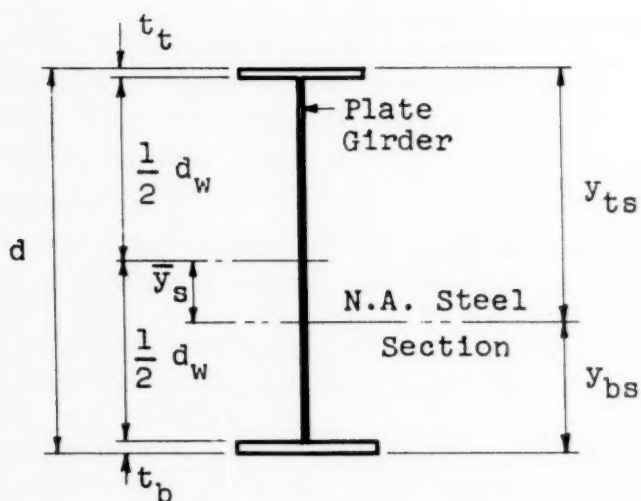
UNSYMMETRICAL PLATE GIRDER
